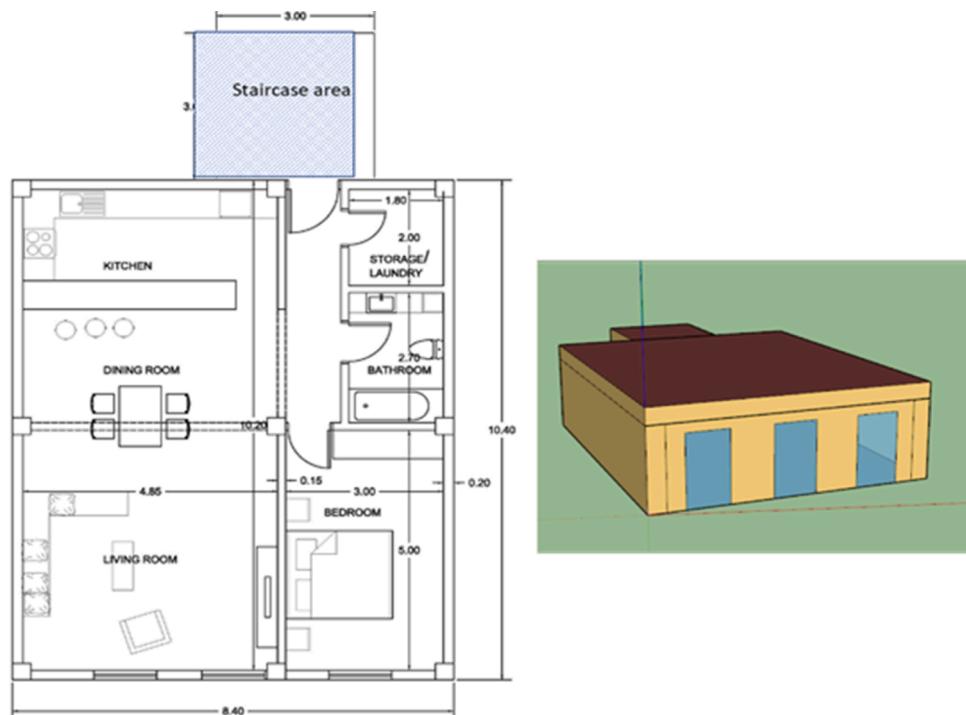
Plan of the generic building unit and the corresponding 3D model.
